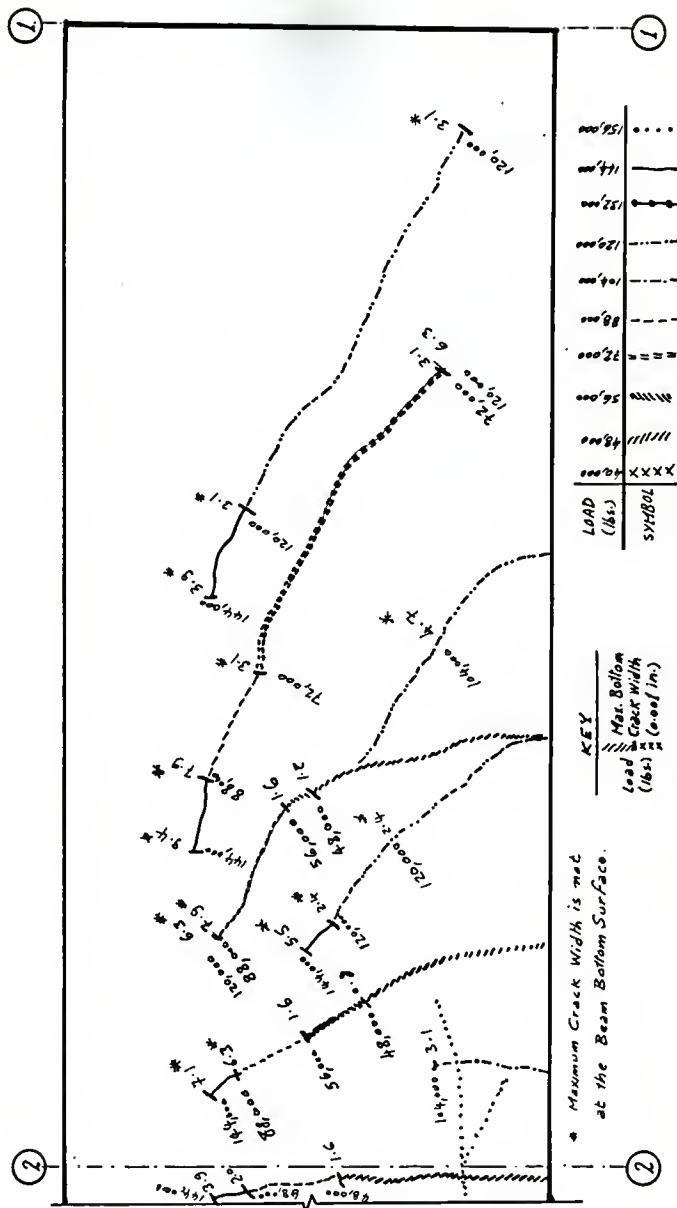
Detail of Crack Propagation of Beam #1
